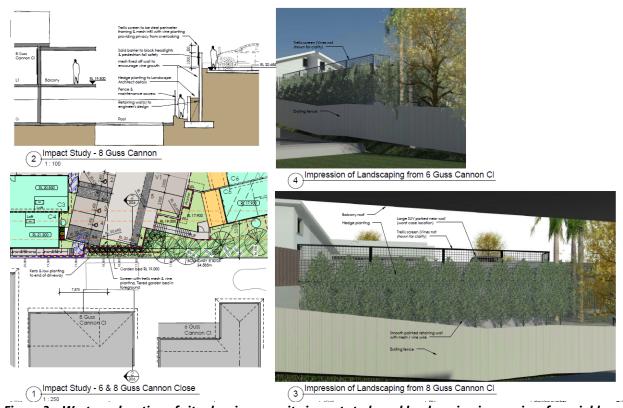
Western elevation of site showing amenity impact study and landscaping impression for neighbouring properties in Guss Cannon Close
